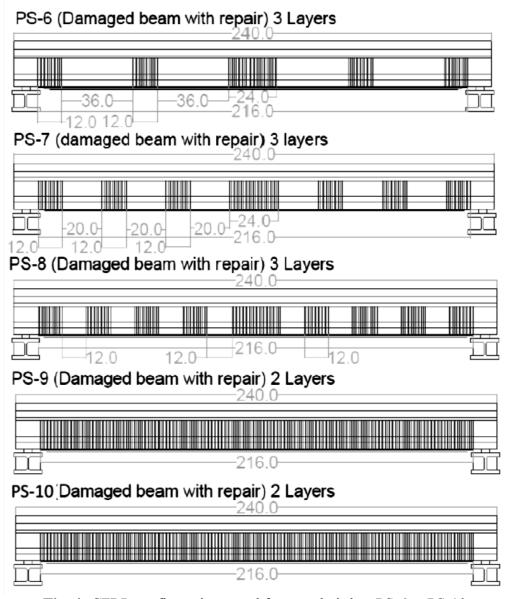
CFRP configurations used for tested girders PS-6 to PS-10
